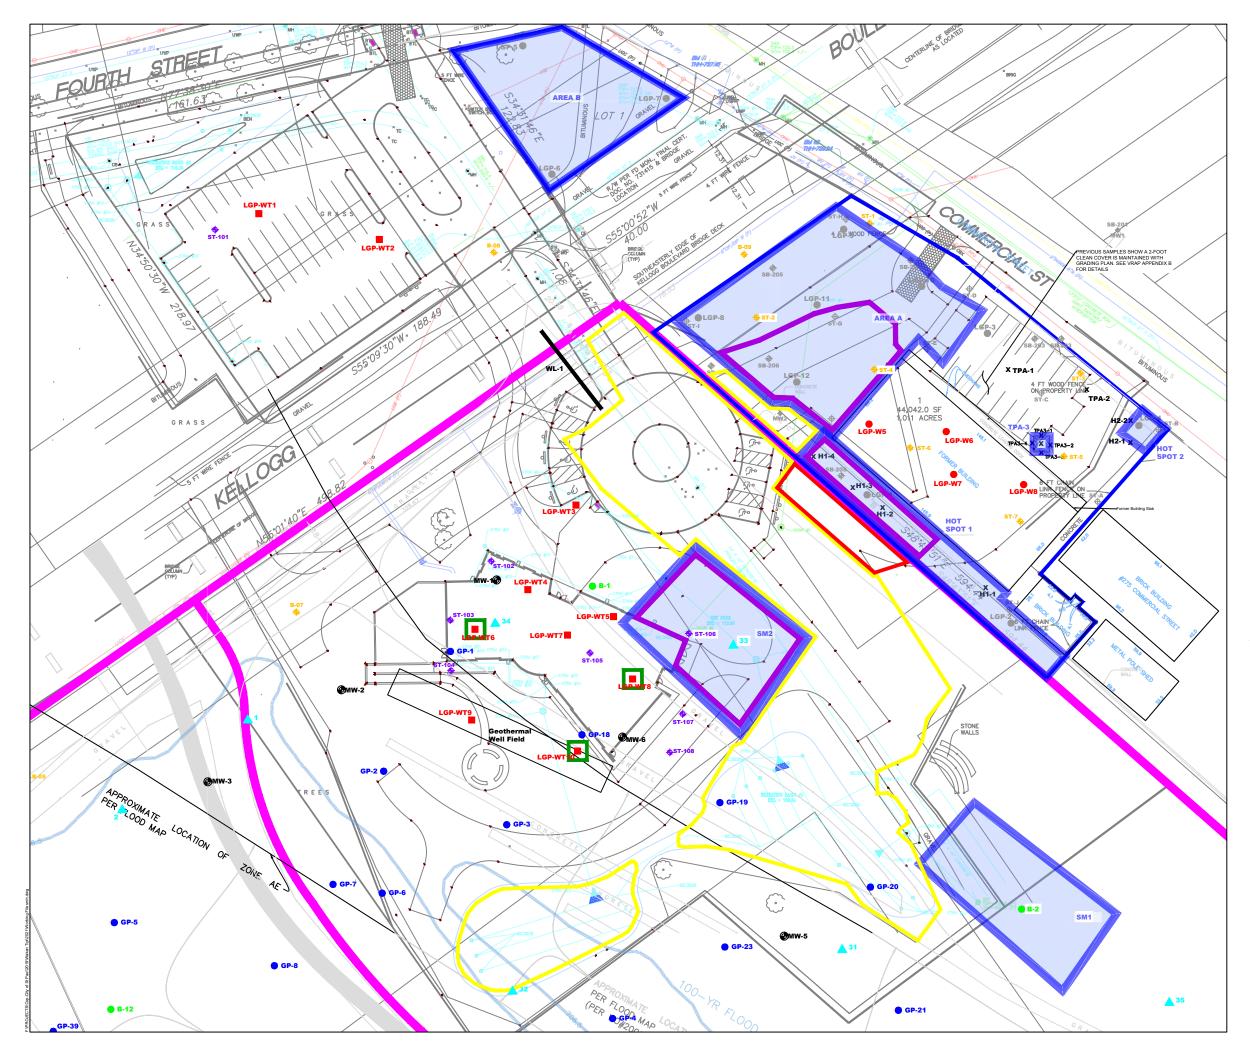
Proposed Development Plan Wakan Tipi Center Saint Paul, MN
